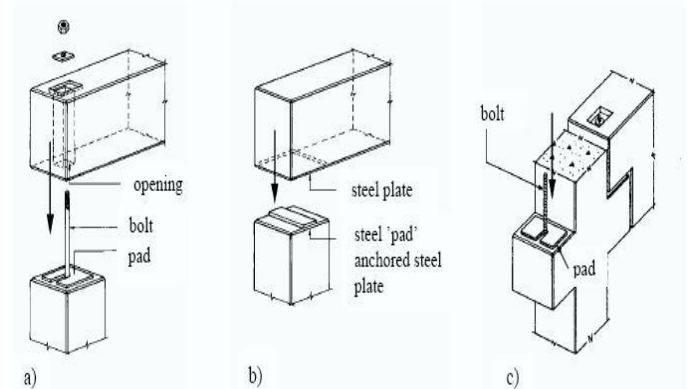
a) beam-column with elastomeric pad, bolt, b) beam-column with cast in place plates, steel plate 'pad', welding, c) beam-corbrel with plain elastomeric pad, bolt
